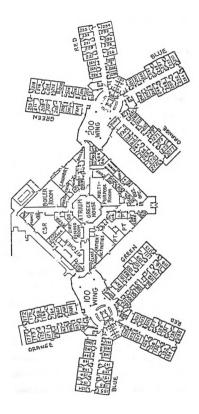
Floorplan of the new Ingham County Medical Care Facility
